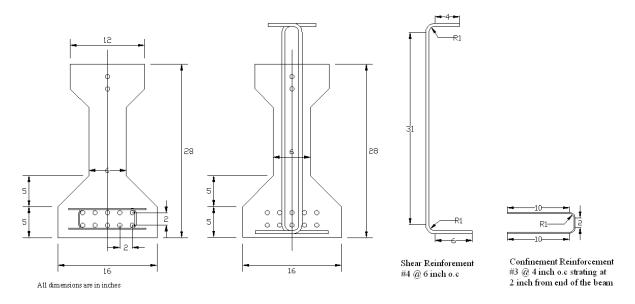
AASHTO Type I girder with 0.7 inch strand arrangement and shear reinforcement details
